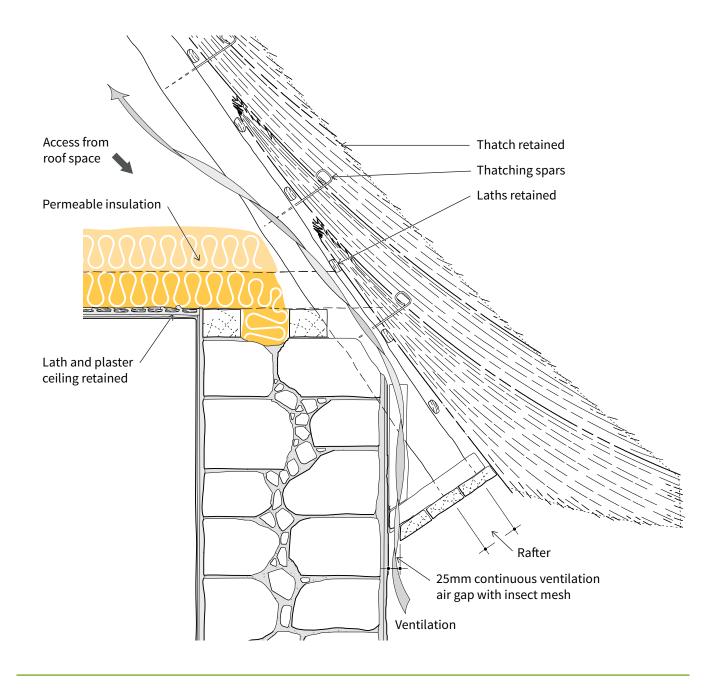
Cold roof – Roof space insulation at eaves A conventional cold roof in a thatched building with a clear ventilation path maintained at the eaves.
